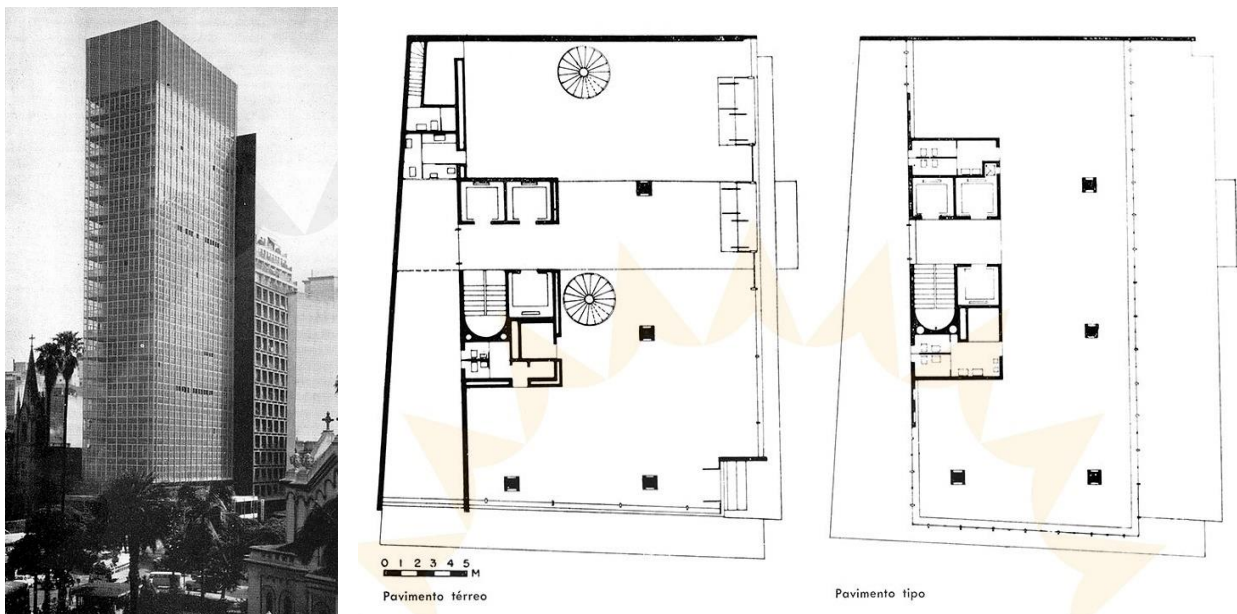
View of the Wilton Paes de Almeida building and ground floor and typical stories (source: Revista Acrópole, 1965)
